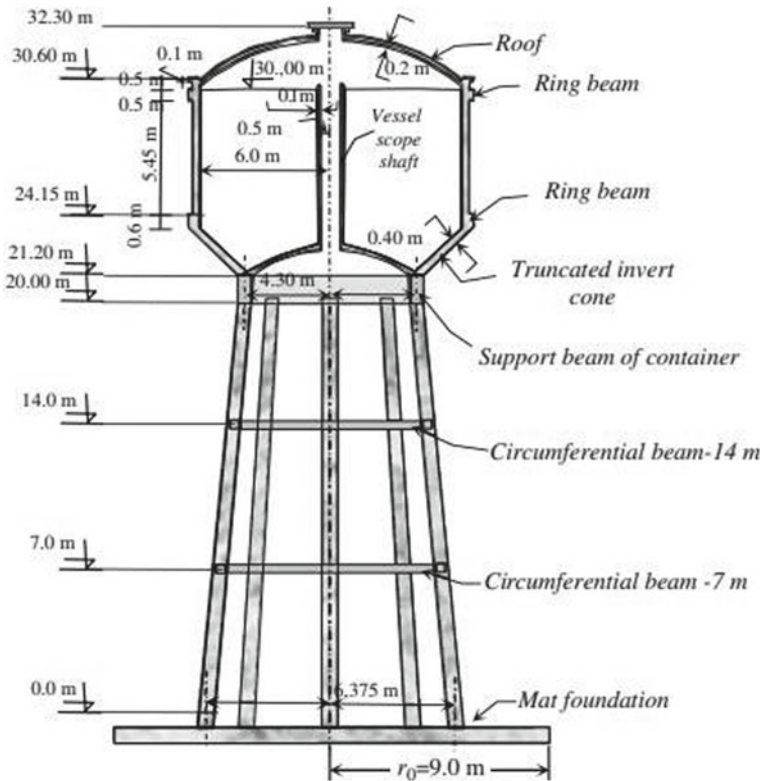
Elevation of the reinforced concrete elevated intze tank (courtesy R. Livaoglu [3])
